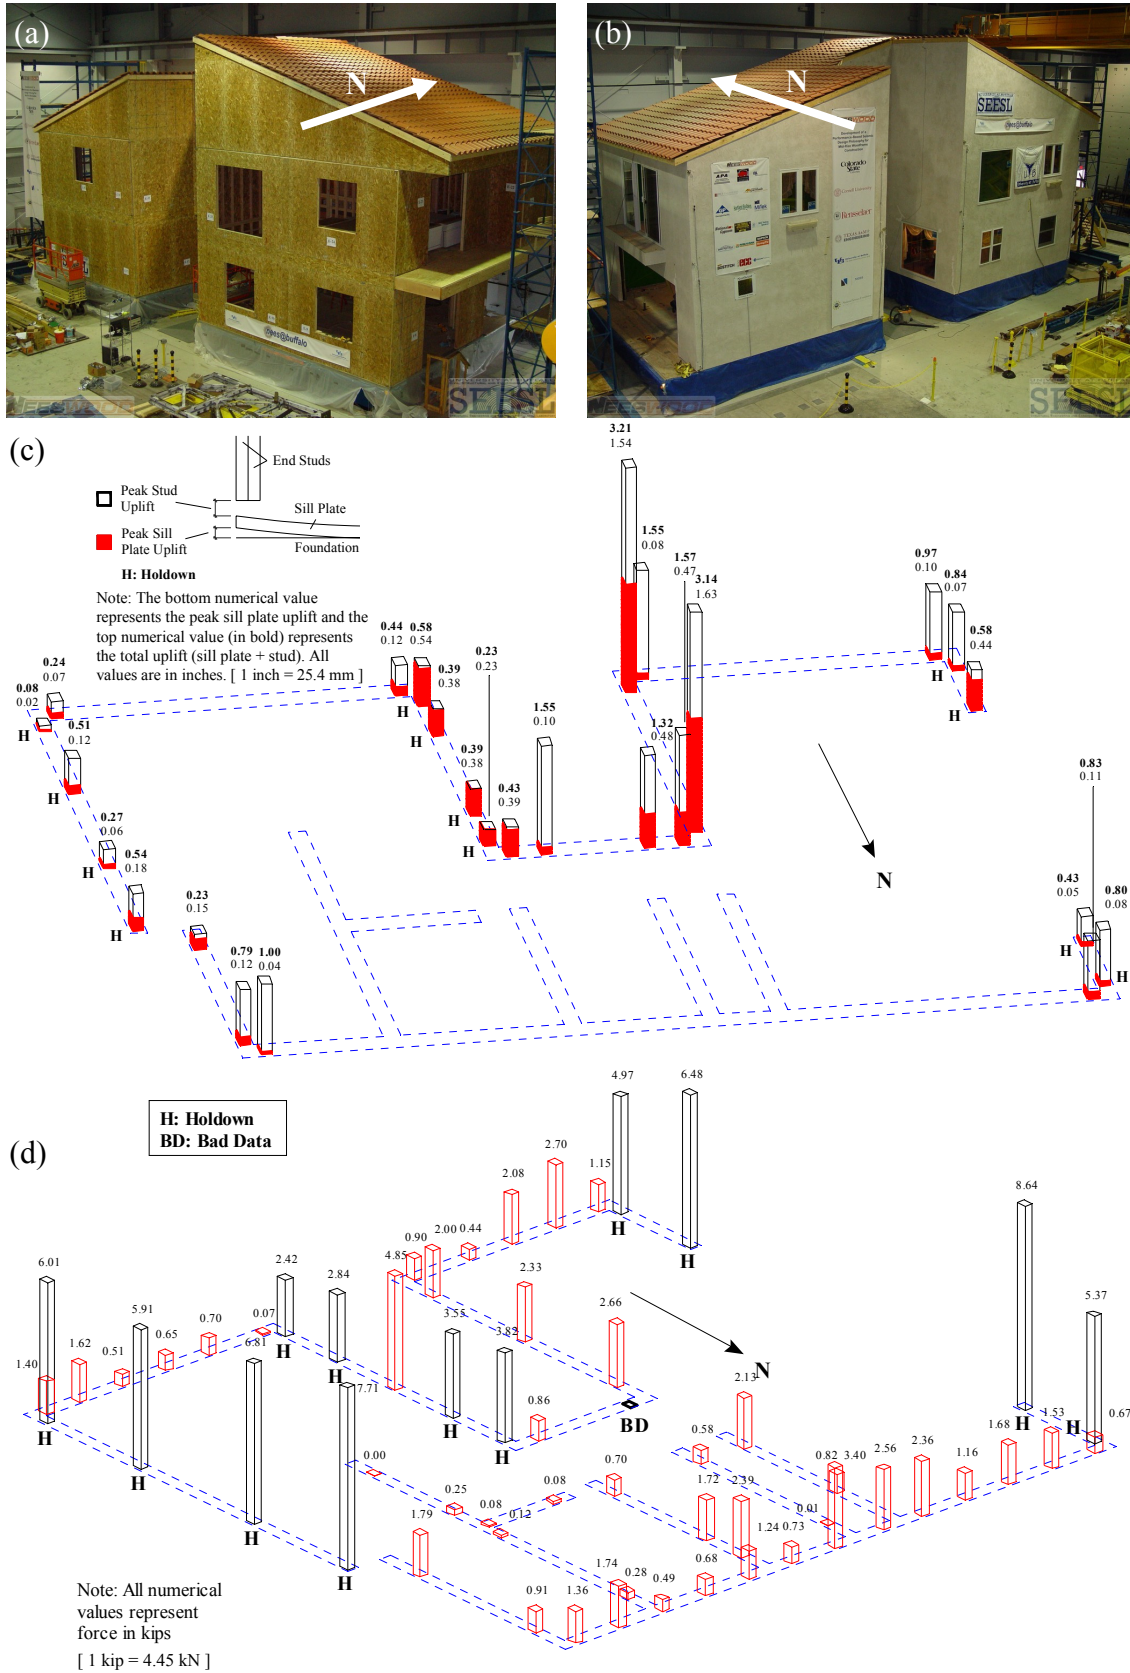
University at Buffalo NEESWood benchmark tests, (a) south-east view of the test structure featuring only the structural wood shear walls, (b) south-west view of the test structure featuring the structural wood shear walls and the non-structural wall finishes, (c) peak sill plate and stud uplift for MCE level tri-axial seismic motion, and (d) peak anchor bolt and holdown forces for MCE level tri-axial seismic motion (after [30])
